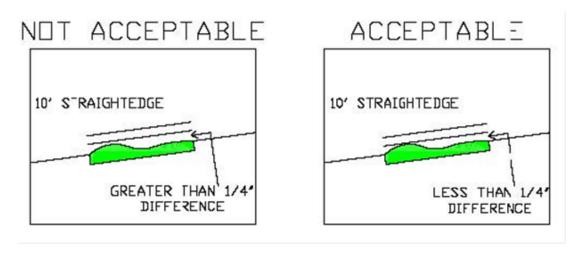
Example 8: Surface tolerances for street repairs should meet the standard for new construction.
